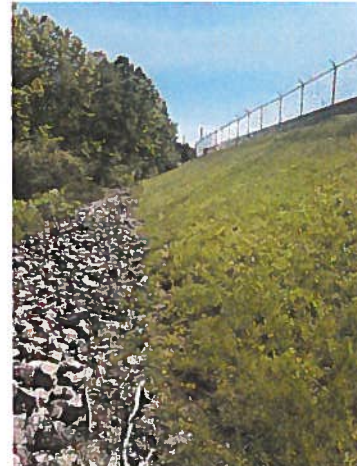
Typical view of exterior embankment showing good conditions of the slope and rip rap.
